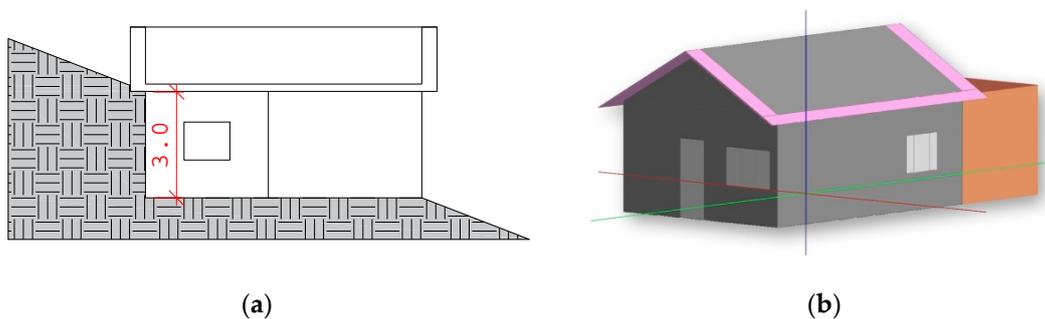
(a) Schematic section and (b) modeled bermed earth-sheltered wall located in the bedrooms.
